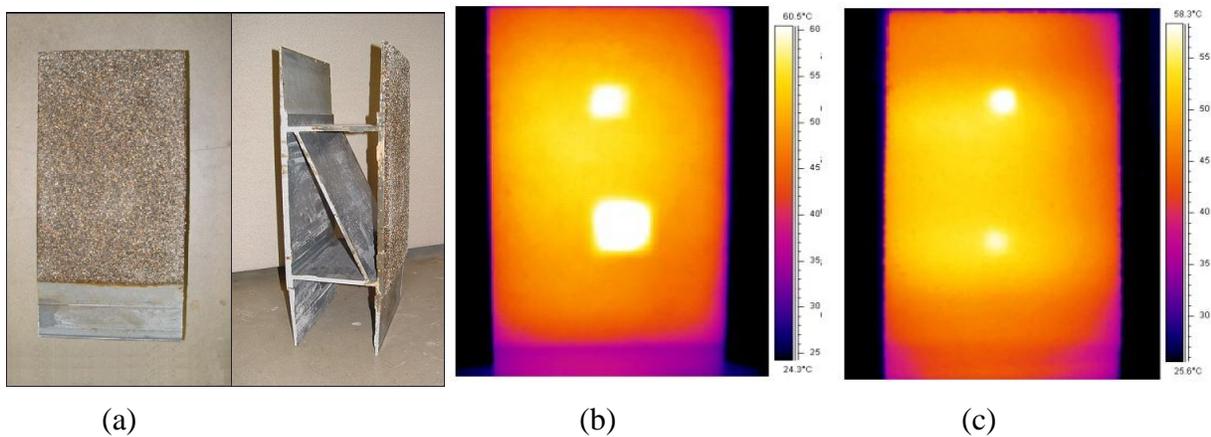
(a) Front and c/s views of the GFRP bridge deck specimen with wearing surface (left picture); Infrared image of the GFRP bridge deck specimen (b) air-filled debonds (2'' to 3'') and (c) air-filled debonds (1/2'' to 1'') (Halabe et al. 2007)
